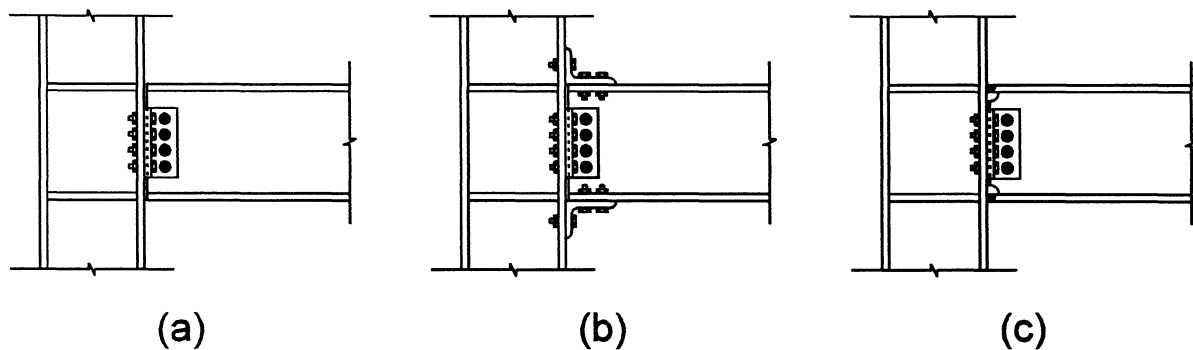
Flexible, semi-rigid, and rigid connections (adapted from Nader, 1996)
